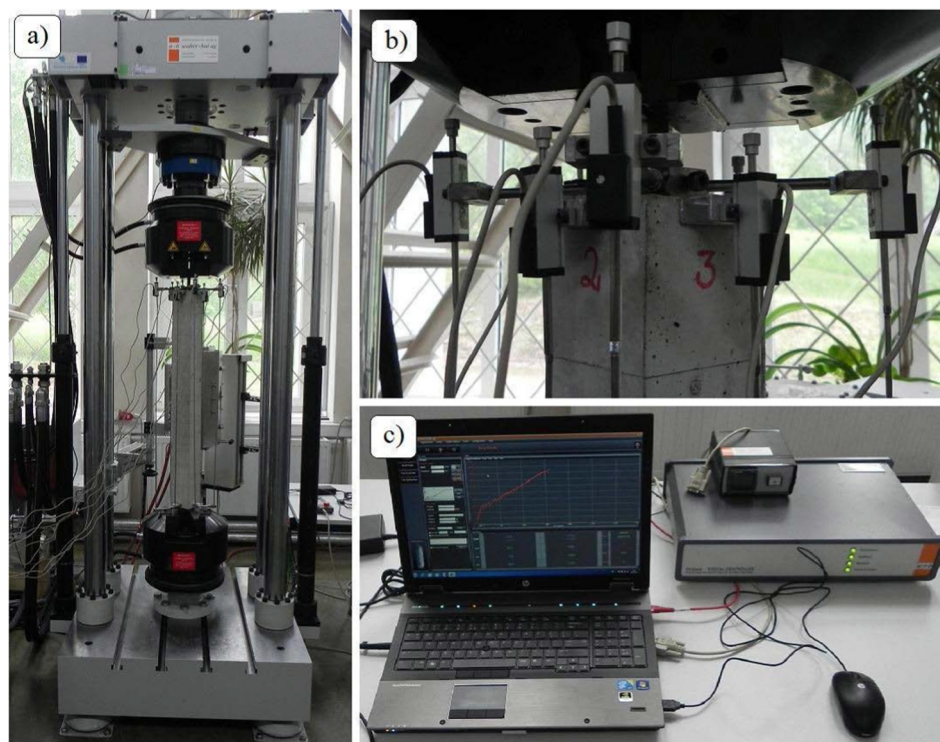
Test setup: a) testing machine; b) layout of LVDTs; c) data acquisition equipment.
